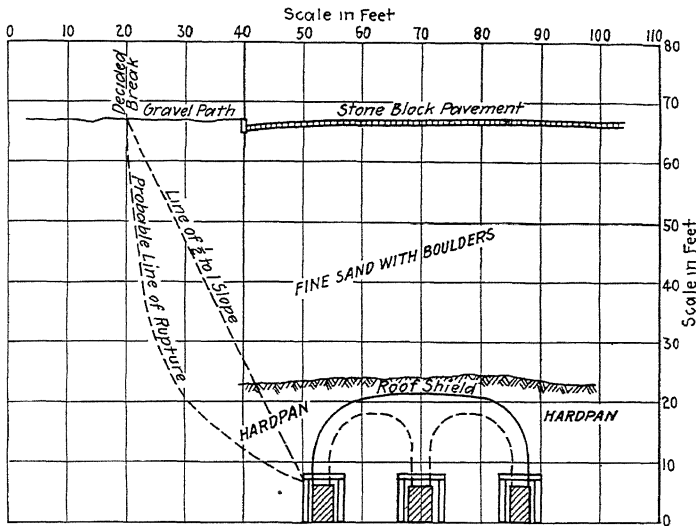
TRANSVERSE SECTION OF SUBWAY TUNNEL; ROOF-SHIELD METHOD.
